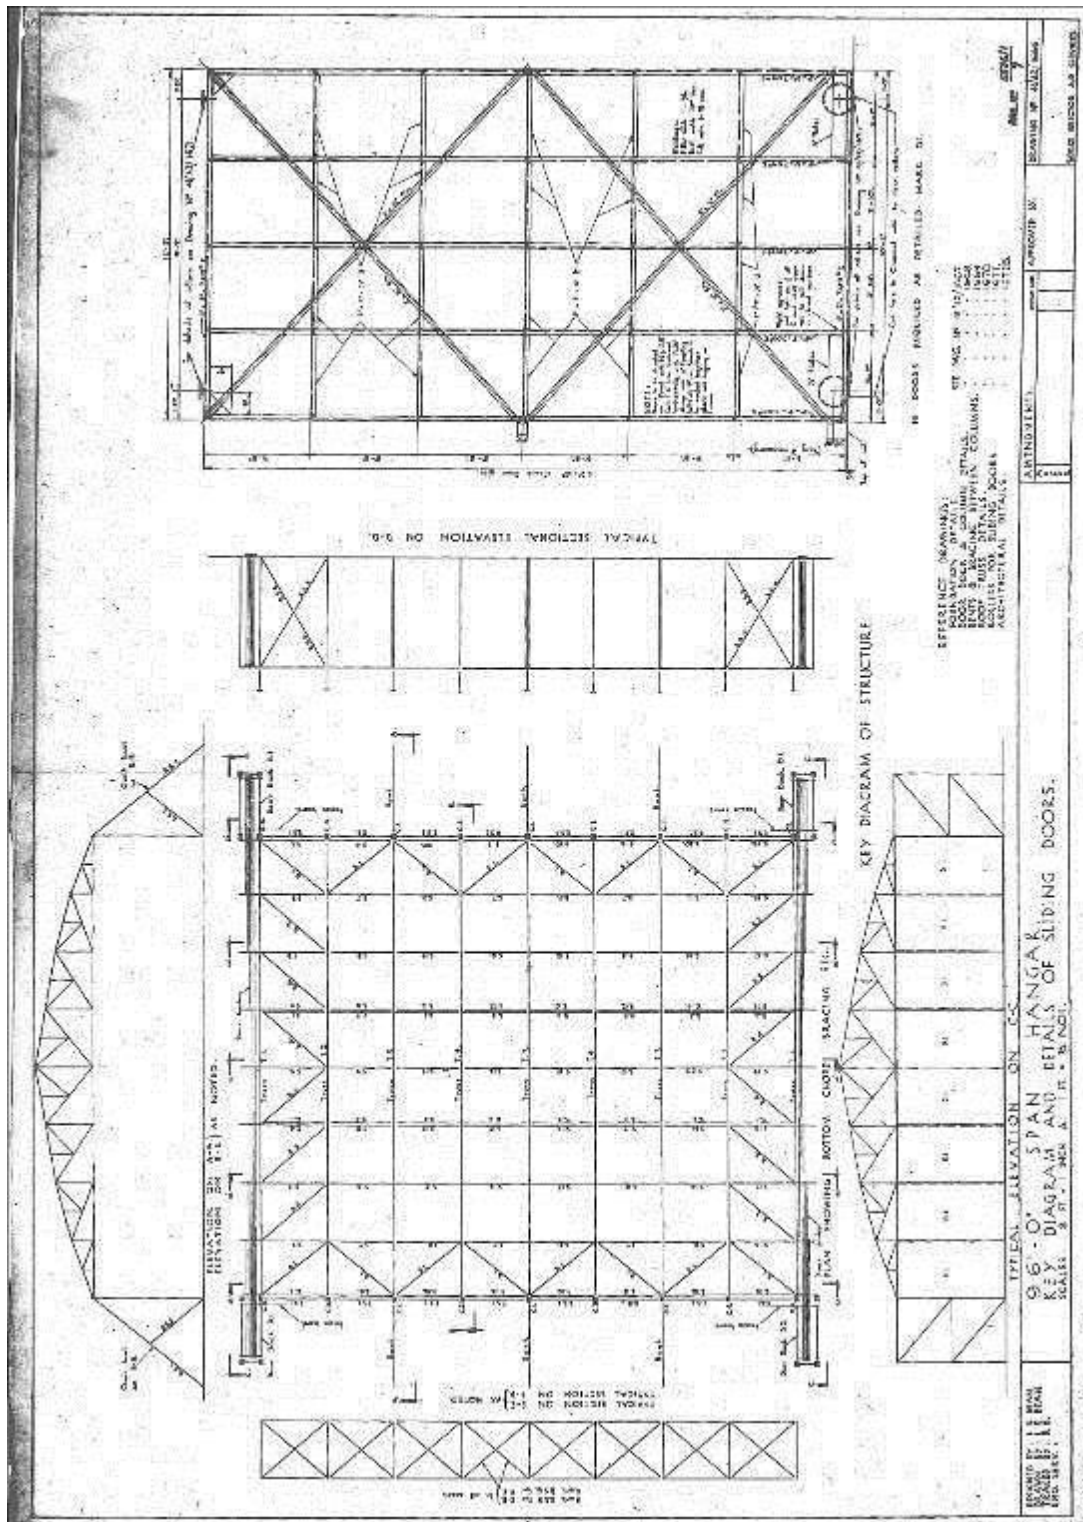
Key Diagram and Details of the Sliding Doors for Hangar 2
